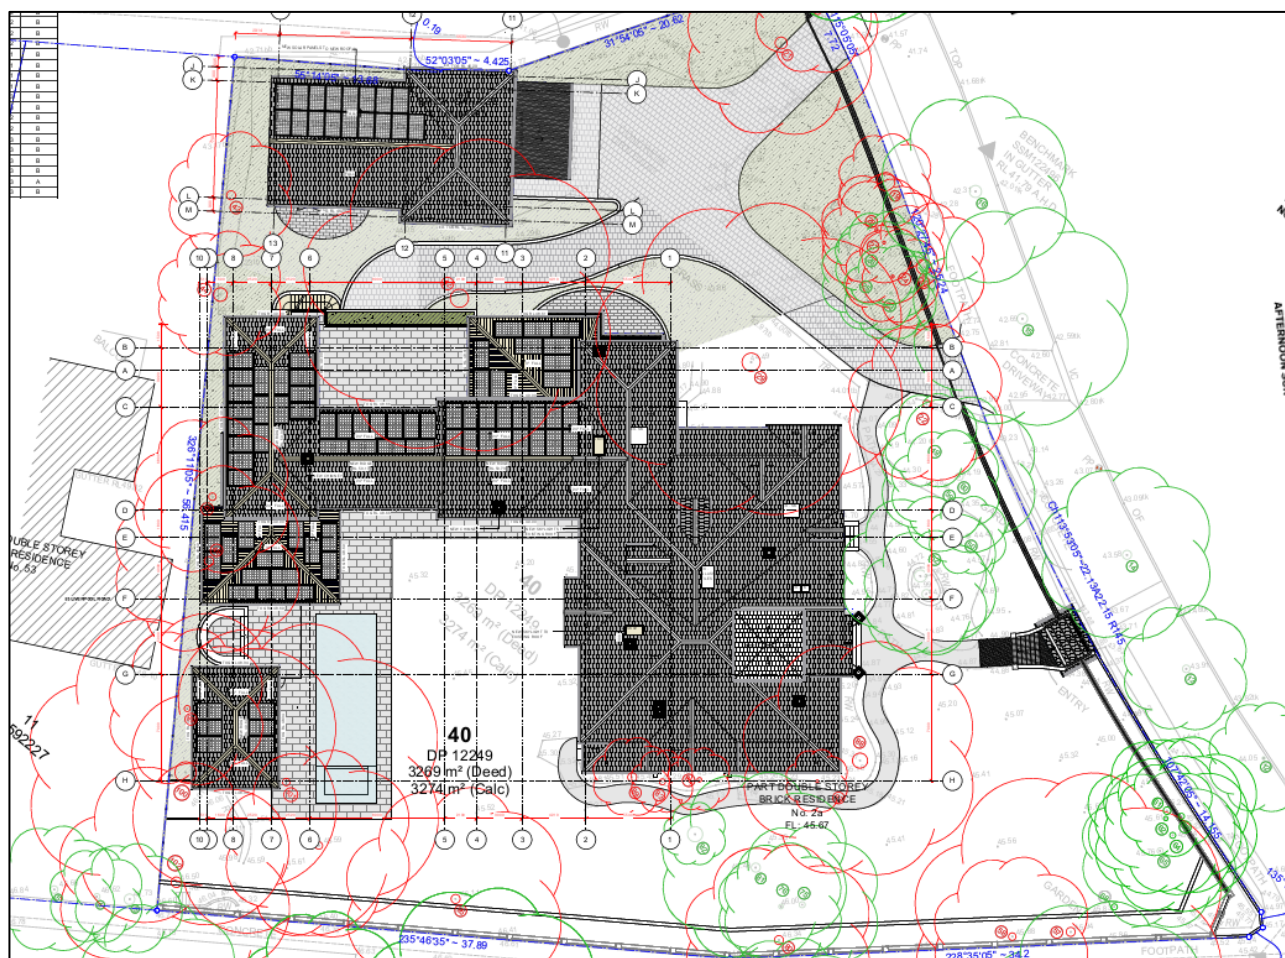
Extract of the applicant's submitted revised Site Plan.
